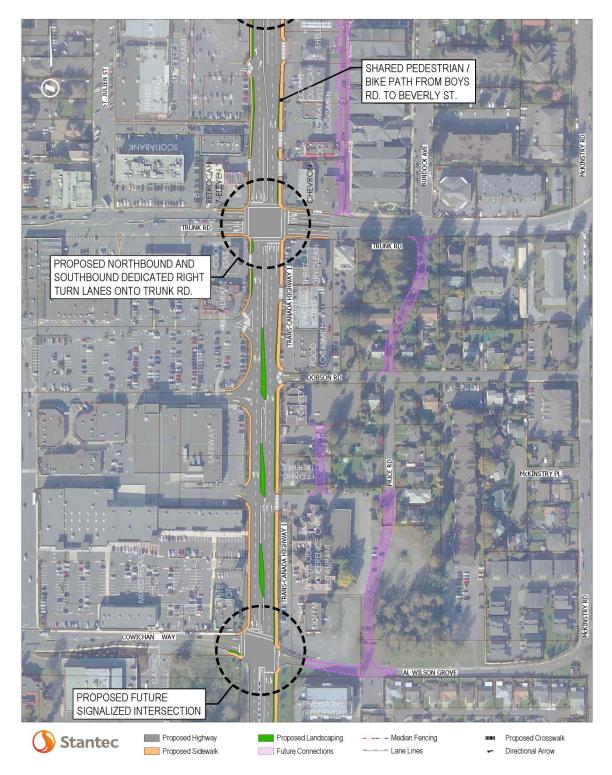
Long Term Transportation Plan–Cowichan Way to Trunk Road
